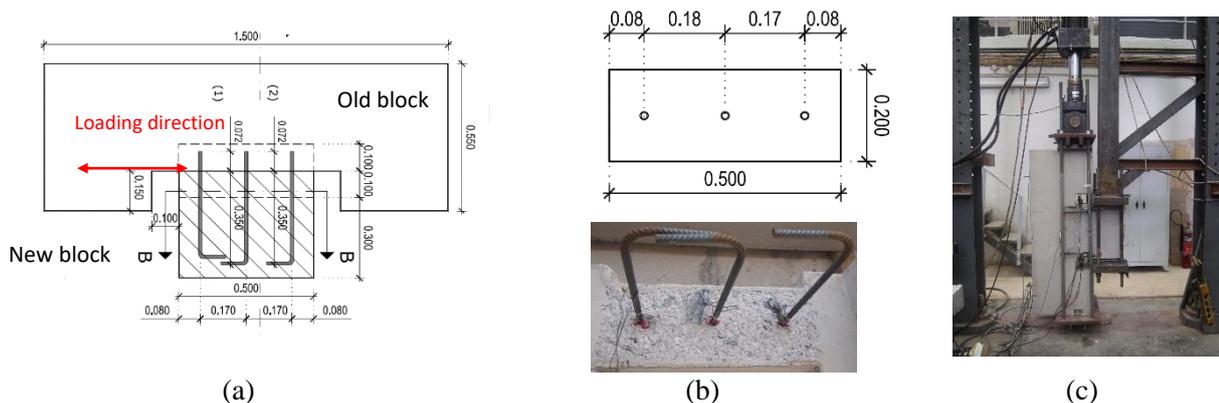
(a) Geometry of specimens (b) Interface reinforcement and photo of roughened interface, with the reinforcement positioned, before concreting the block simulating the new part of concrete (c) Test setup and specimen in testing position
